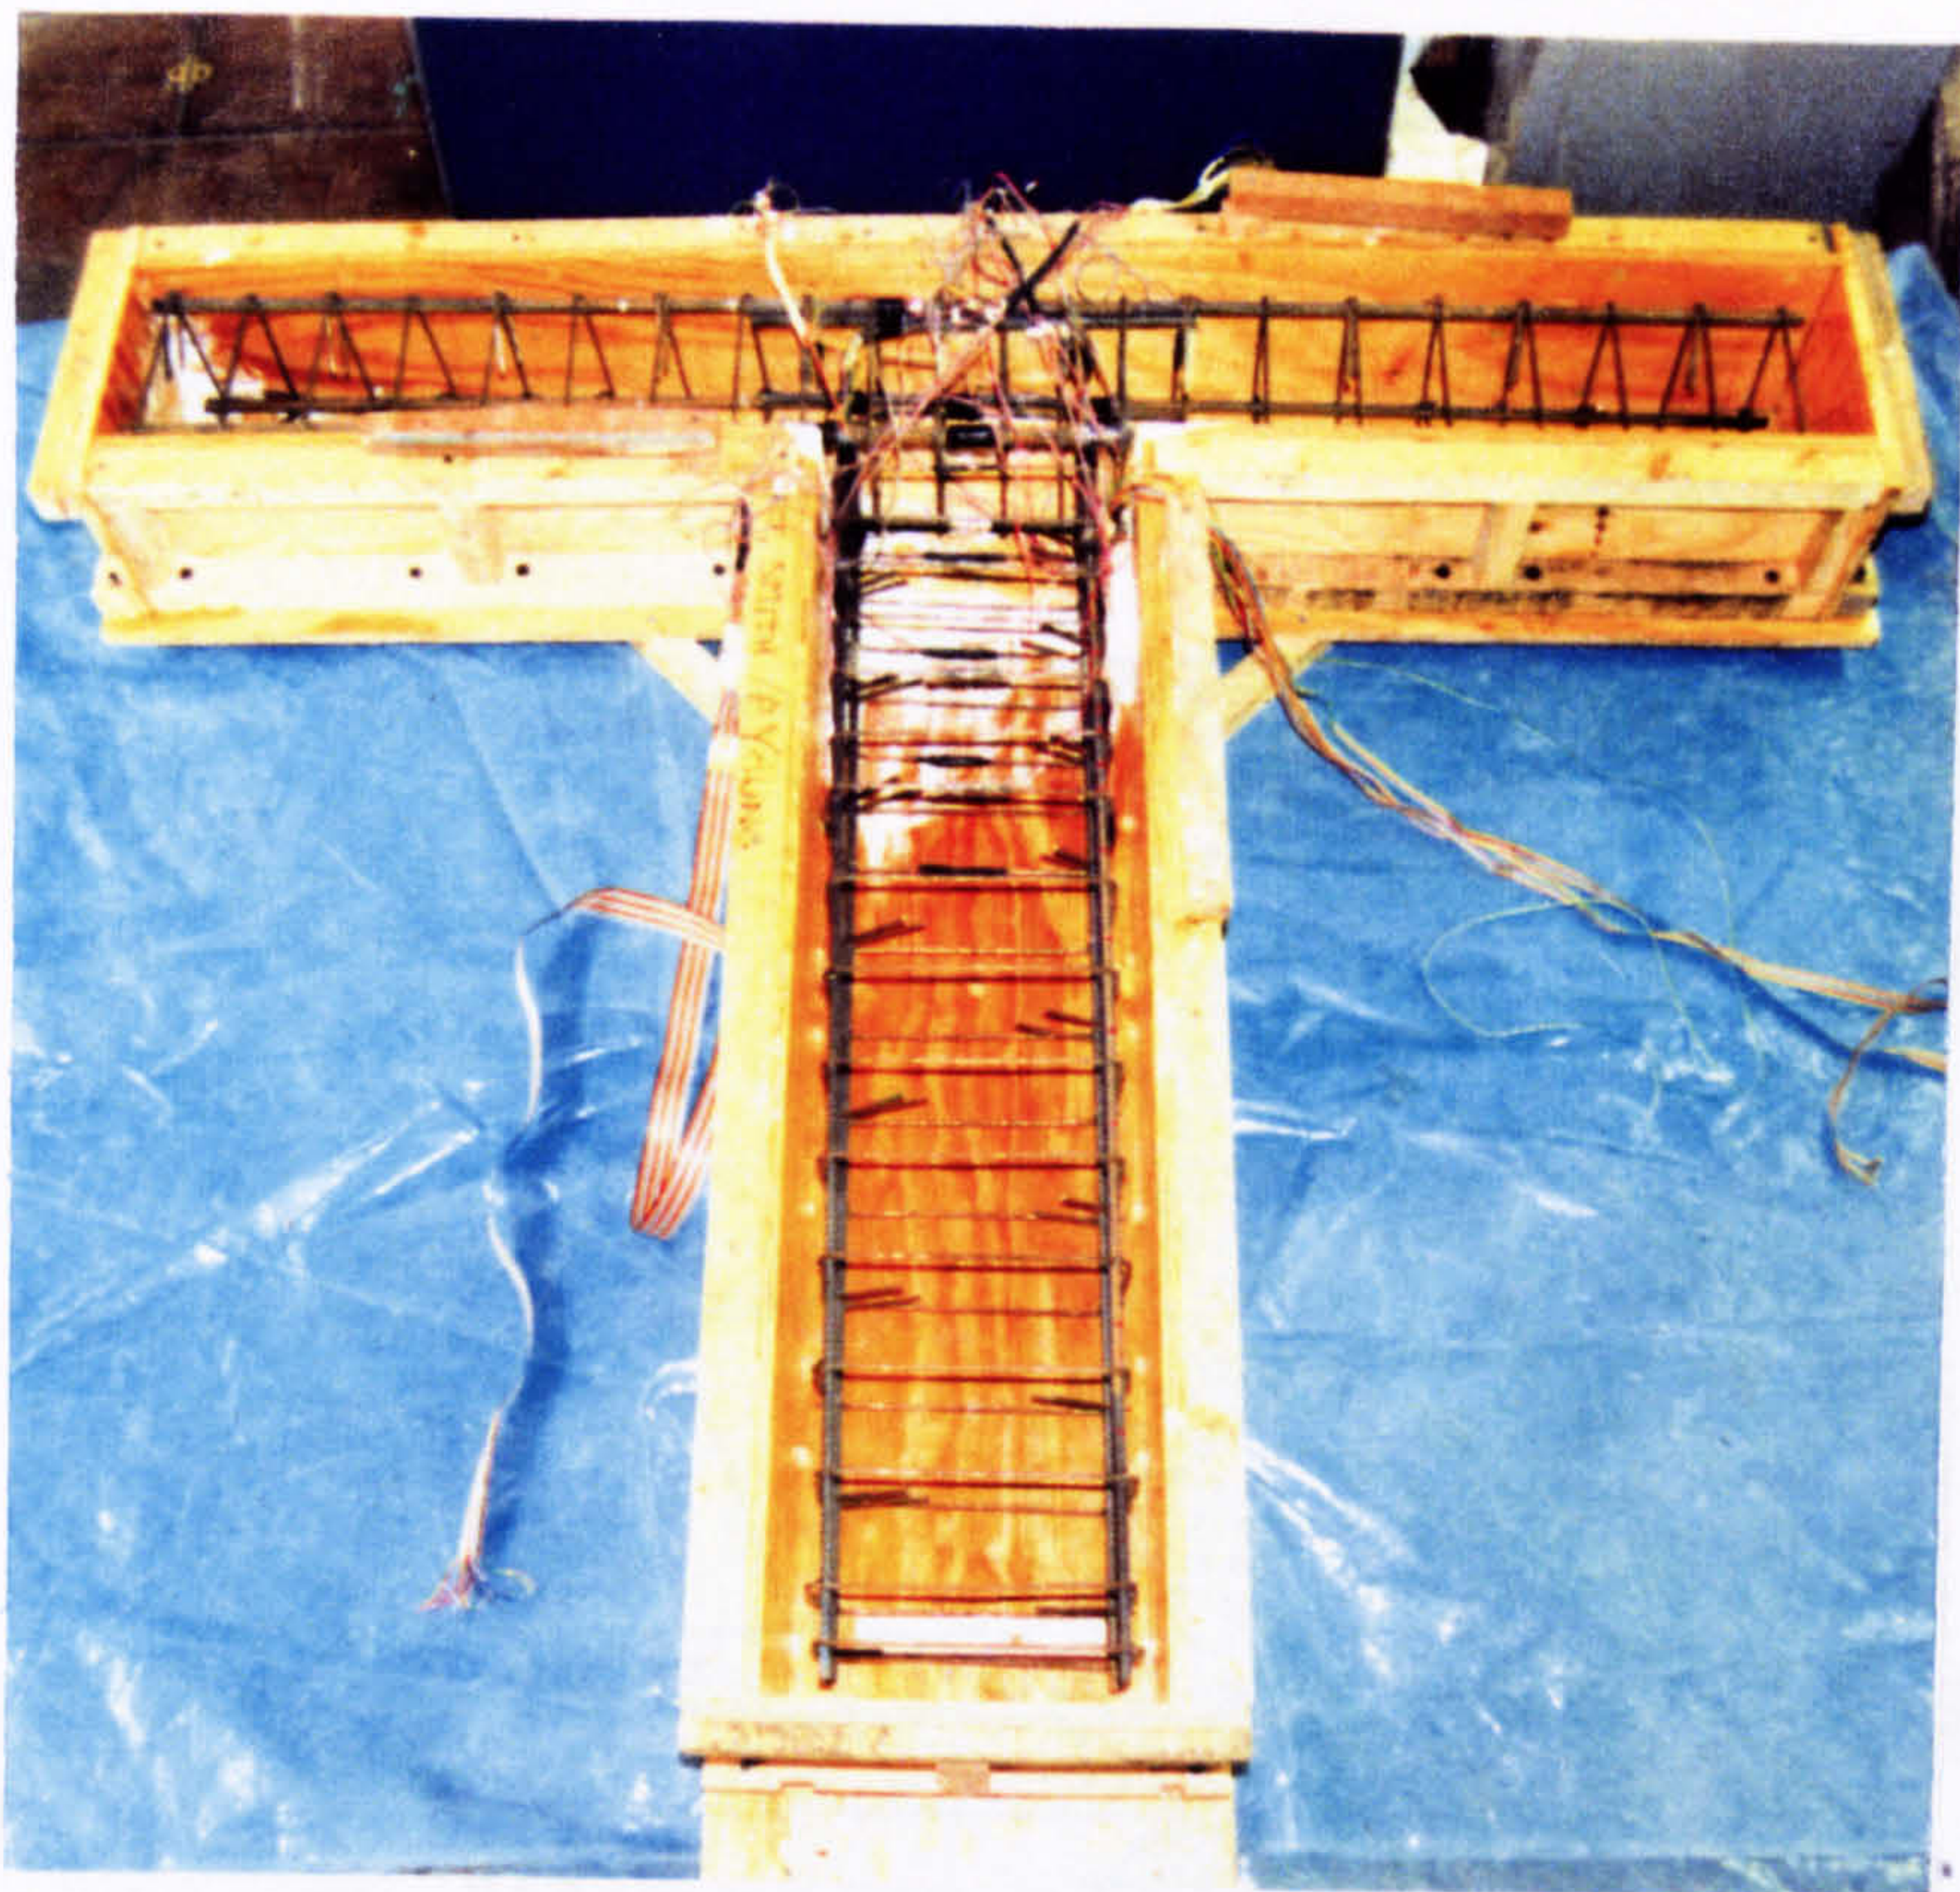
FORMWORK WITH STEEL REINFORCING CAGE
